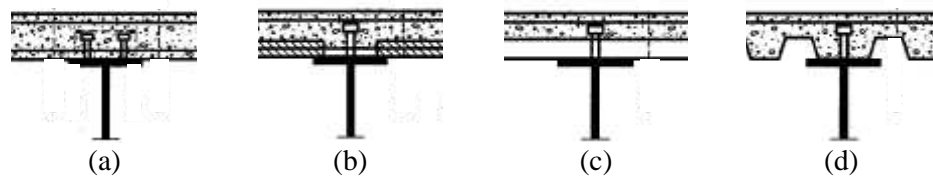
Different applications of stud connectors in composite beams: a) solid slab, b) partly precast slab, c) slab with profiled steel sheeting perpendicular to steel joist and d) parallel to steel joist.
